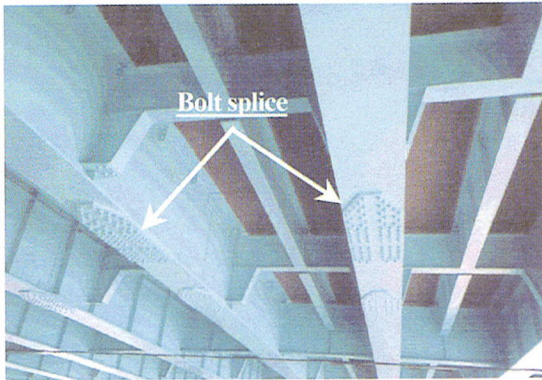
Example of "Repair E" performed by bolt splice at the girder bottom flange in roadway bridge.
